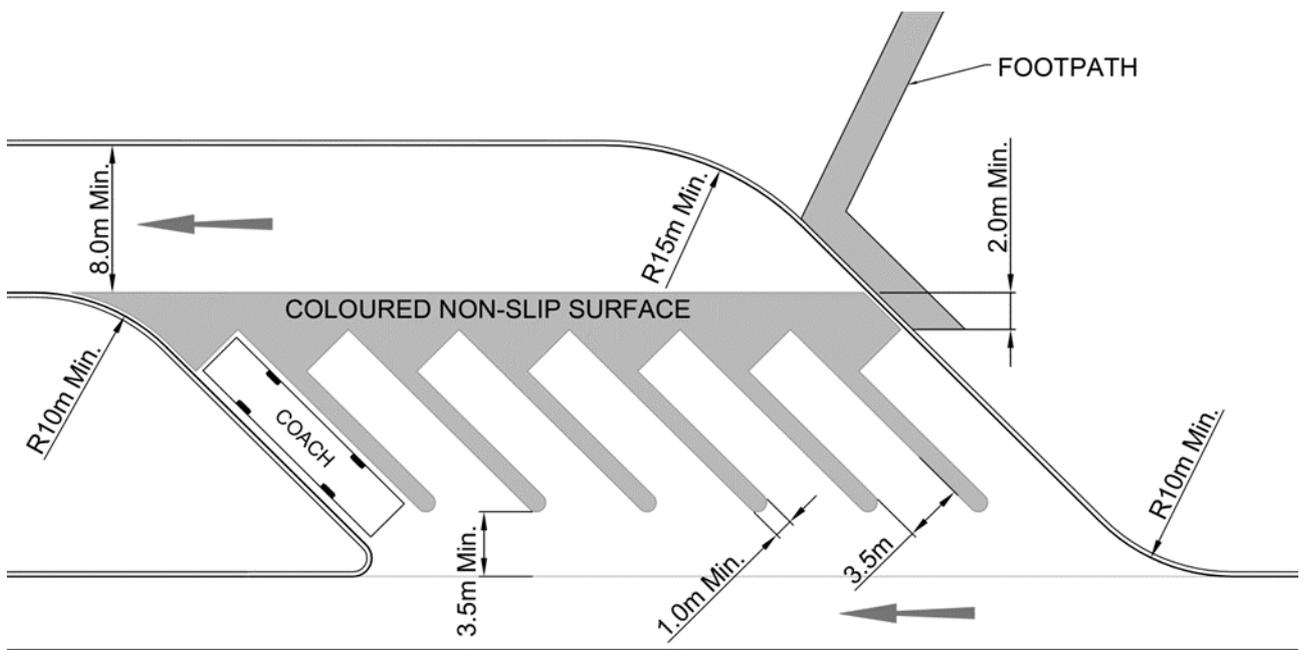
One-way HGV Parking System with Parking Bays at 45 Degrees
